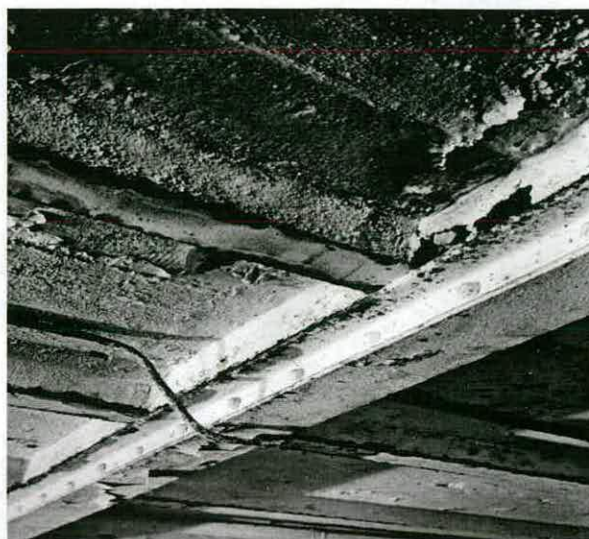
rolled-steel joist/beam connections (EH, BB99/09027).
